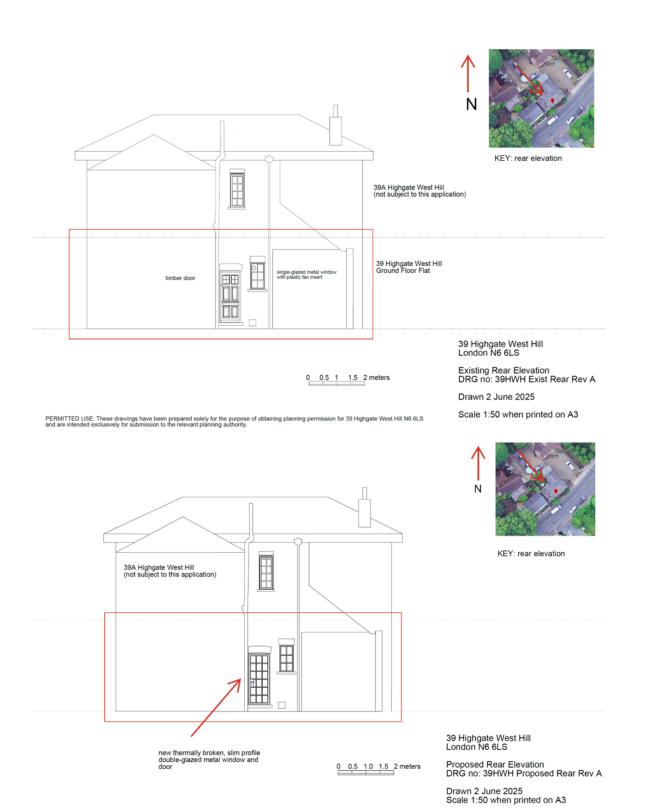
Existing and proposed northeast side elevation (Source: submitted documents)
